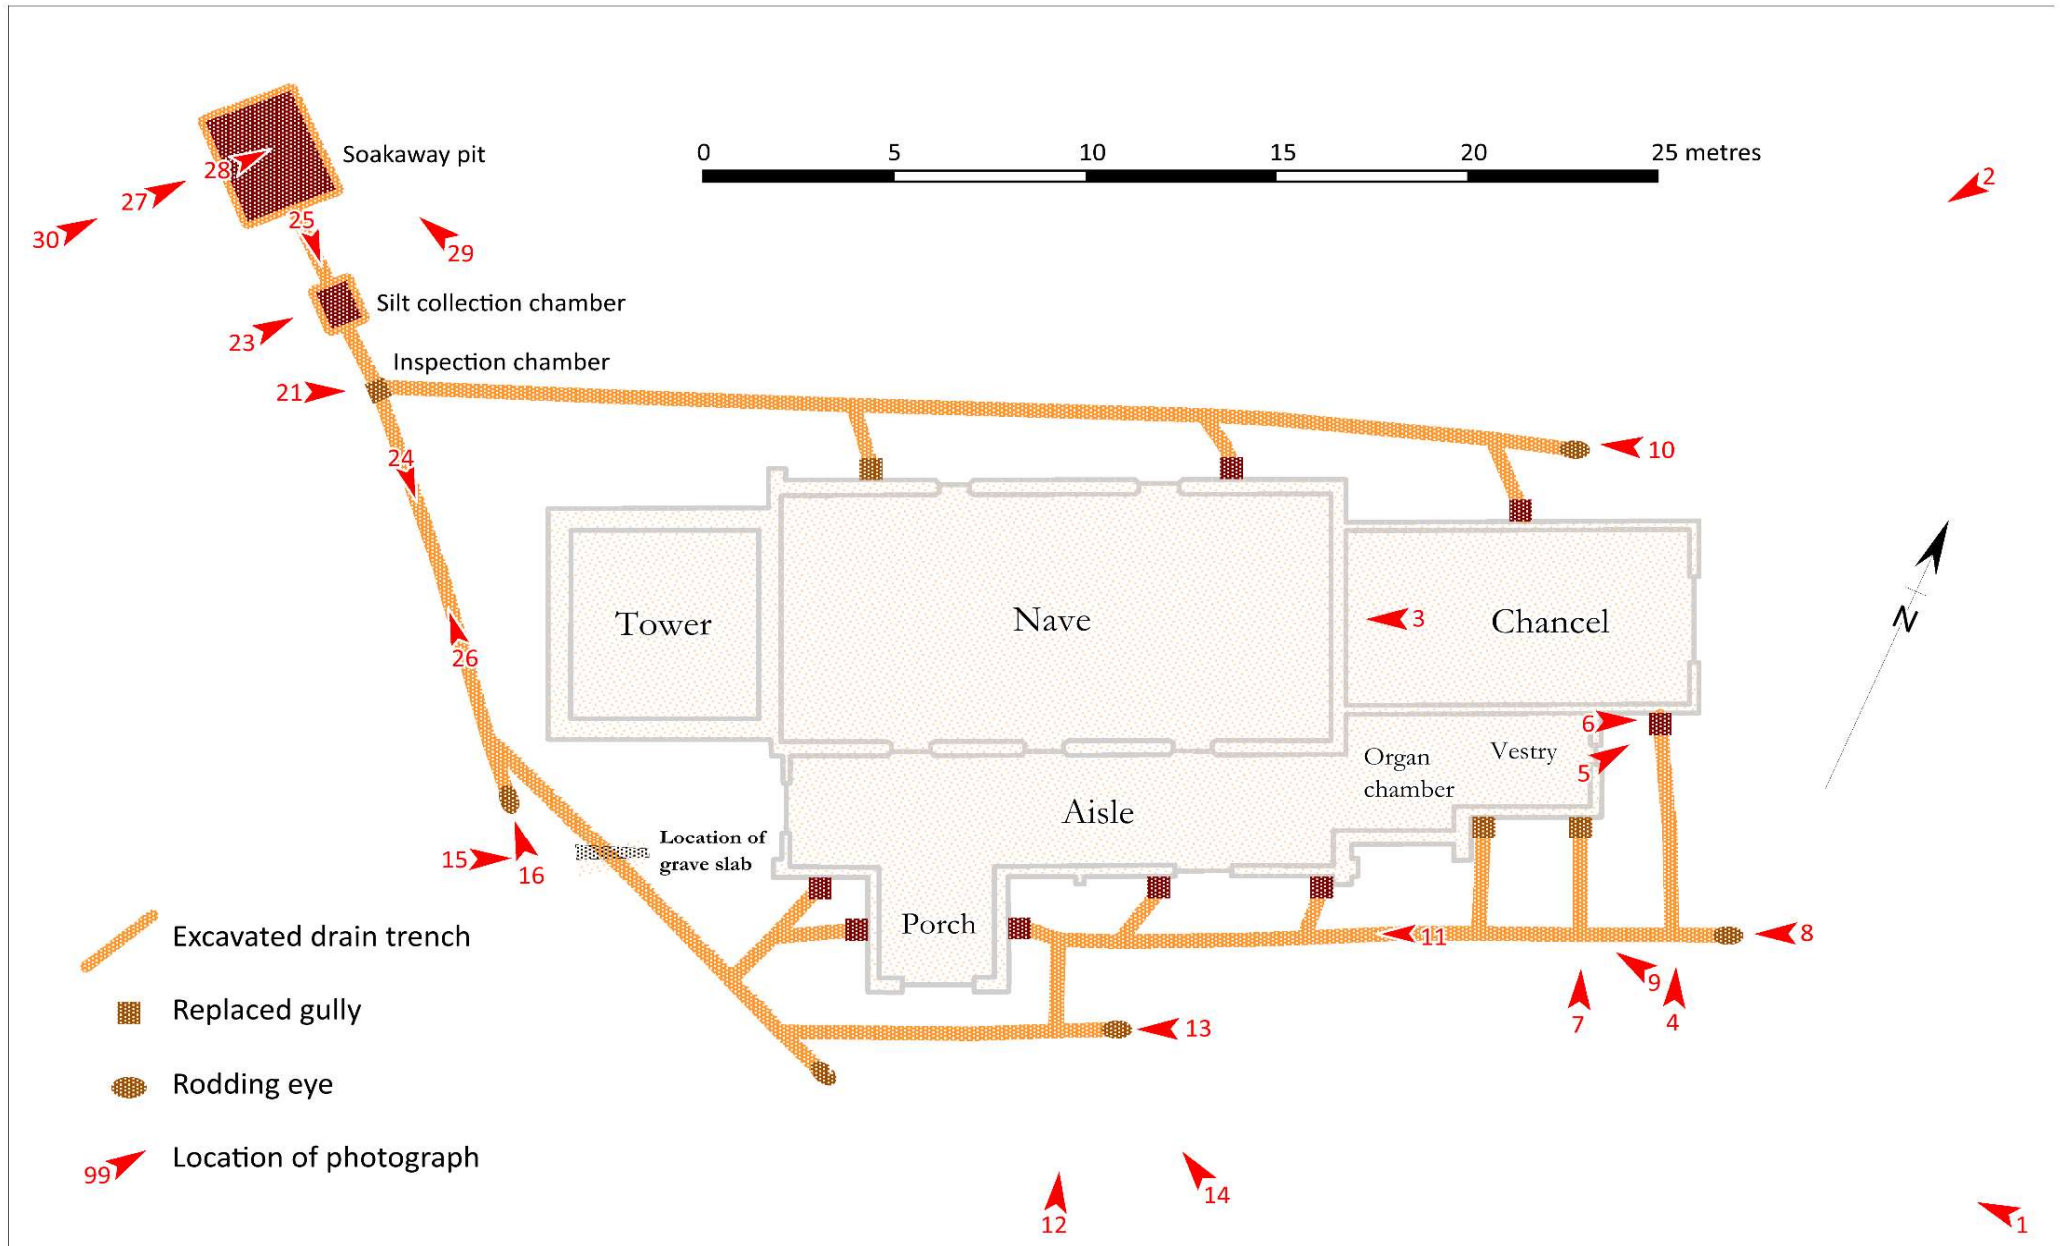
Plan showing layout of the drains as installed, in relation to the structure of the church, scale 1:200
